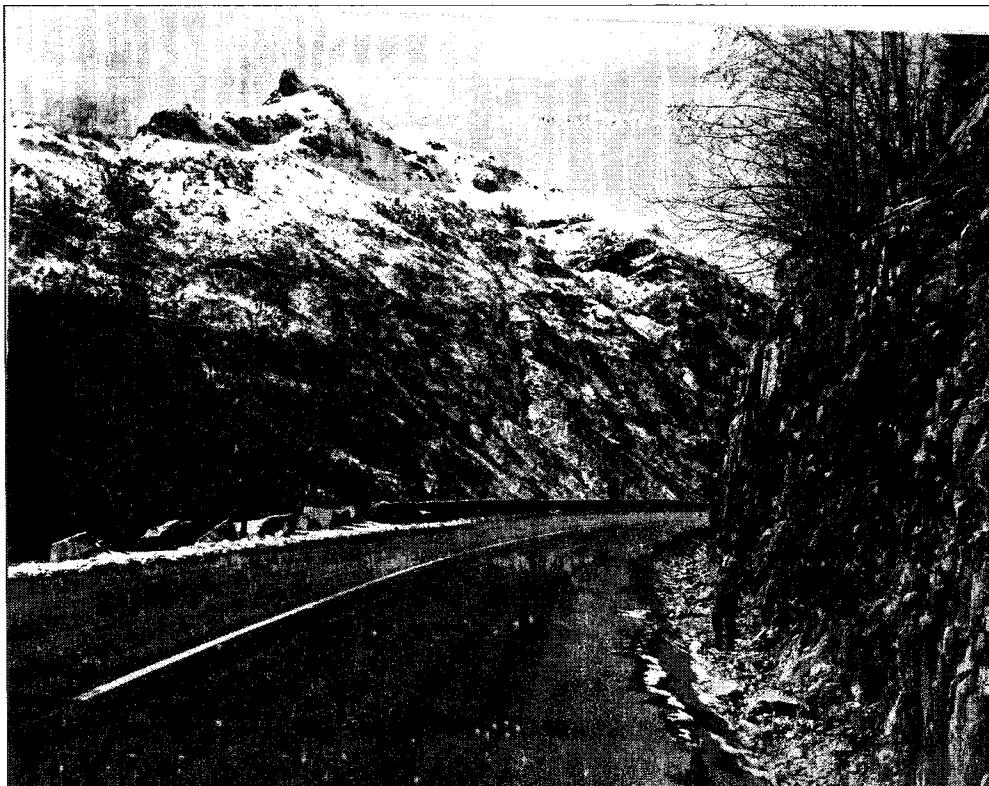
Historic photo showing plan view of Stevens Canyon with rock barriers leading to Type 1 guardwall, and ditch on the inside at base of rock cut, 1963 (MORA Archive).
